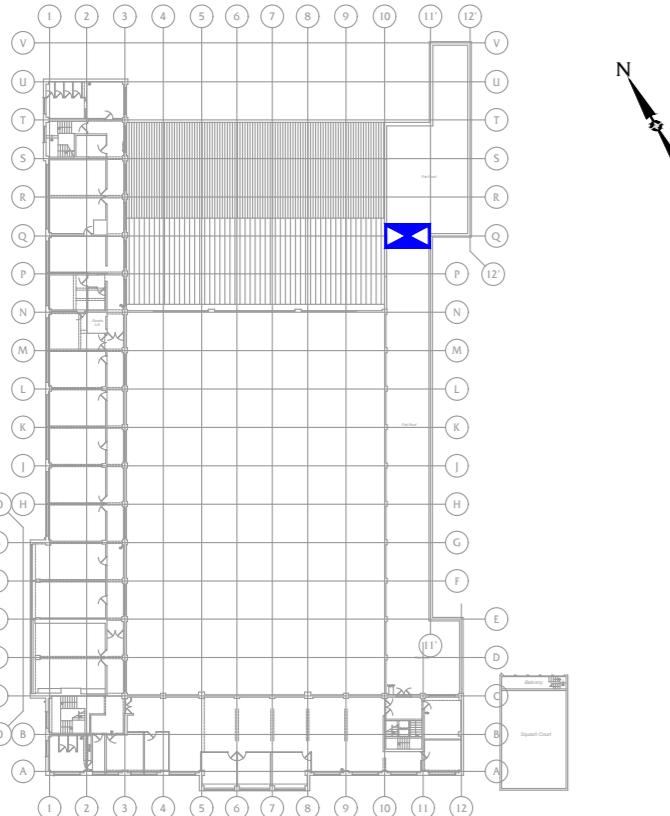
PART REFLECTED 1ST FLOOR SLAB SOFFIT PLAN SHOWING DETAILS OF BEAM AND PRECAST CONCRETE PLANK - SURVEY AREA Q/10-11 SCALE 1:10
